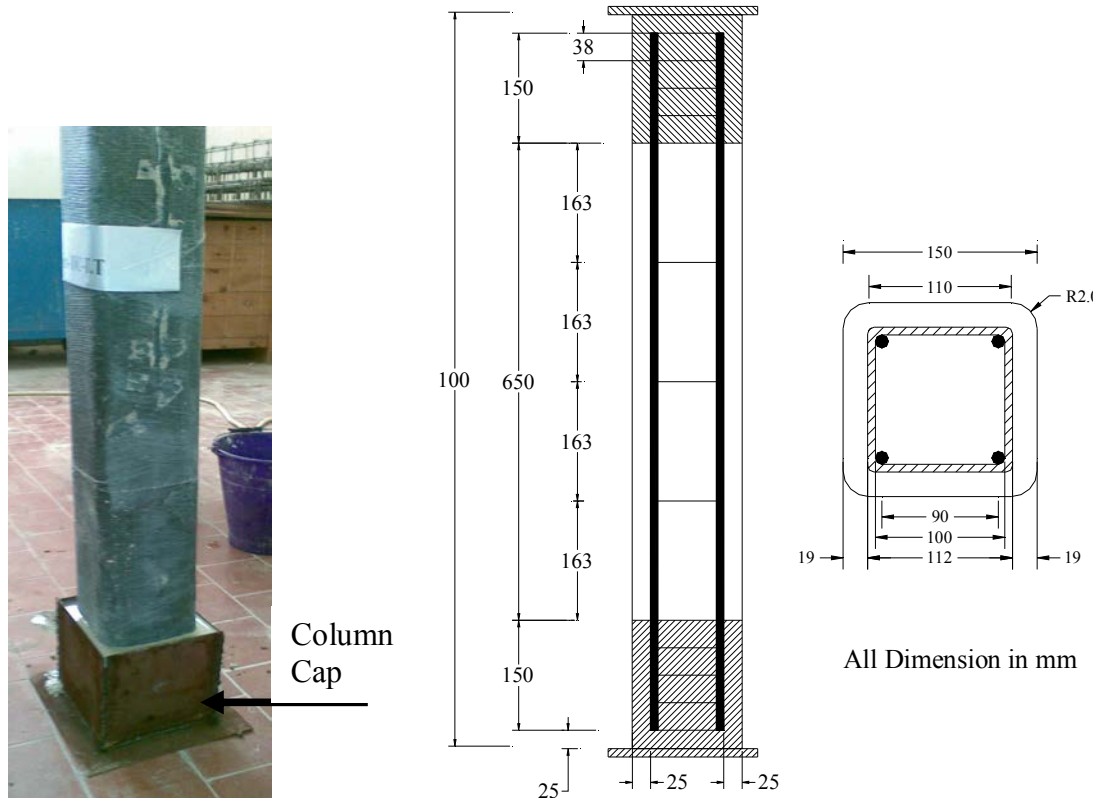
Longitudinal and transverse reinforcing steel arrangement and column capping.
